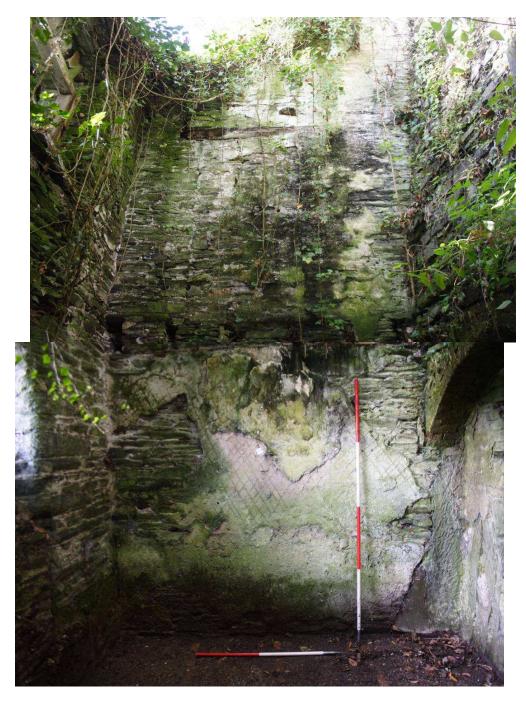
Composite photograph of northeast facing internal wall of Room 2 with blocked doorway or window to first floor level, 2m and 1m scale
